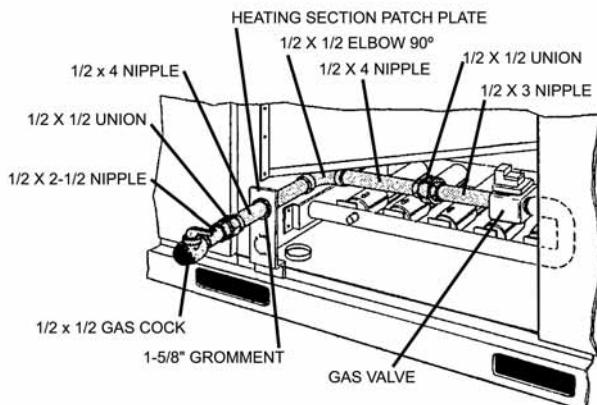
EXTERNAL SUPPLY CONNECTION EXTERNAL SHUT-OFF
